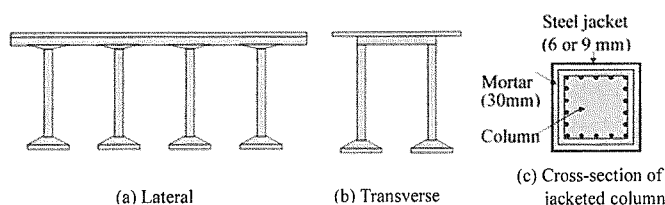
Standard shape of railway viaduct and cross section of jacketed column
